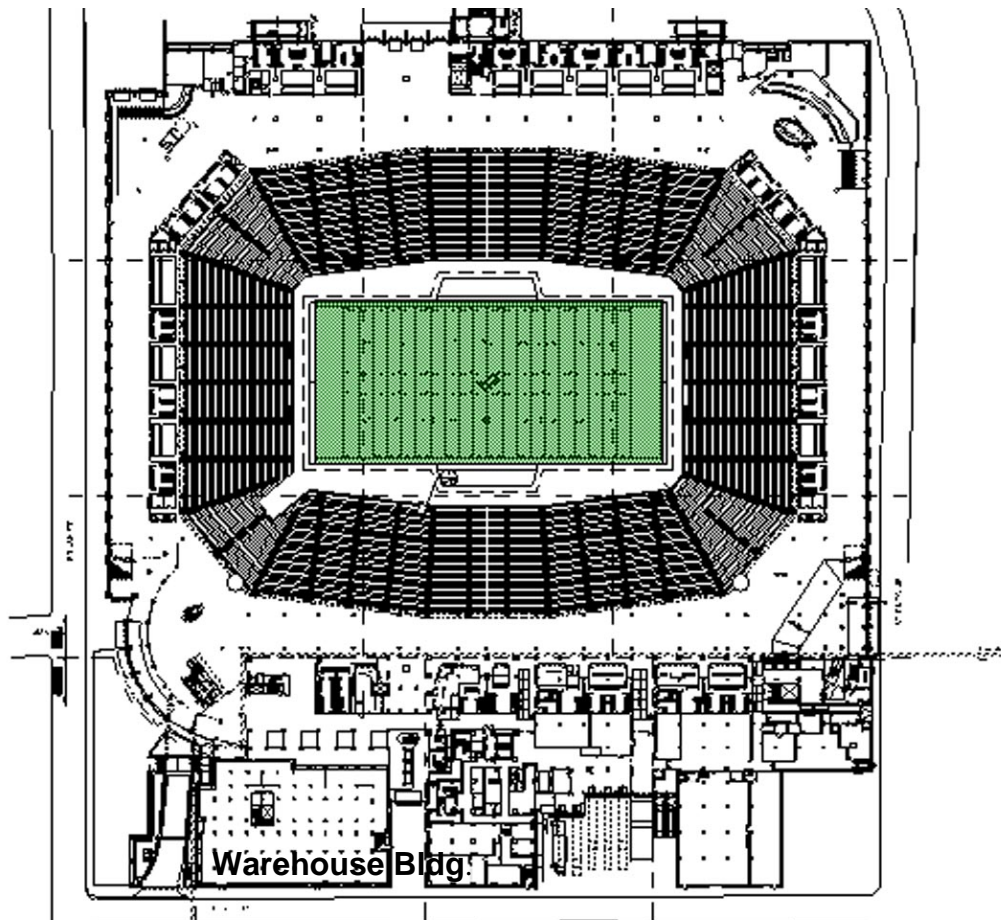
First floor - Lower Level Concourse (30 Restrooms, 25 concessions)
